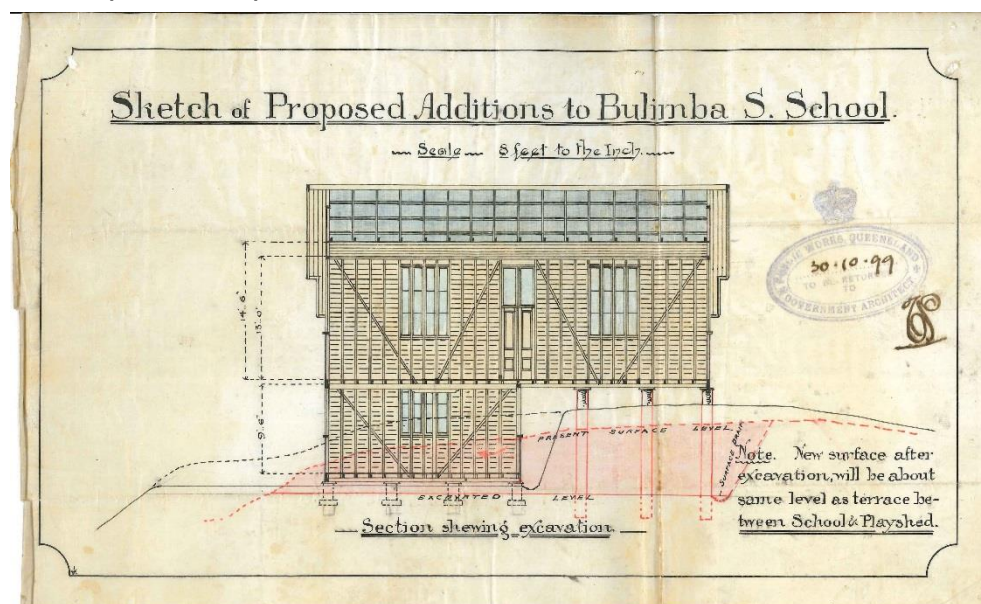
Section of new wing showing internal walls unlined and tall windows (QSA 13998).
